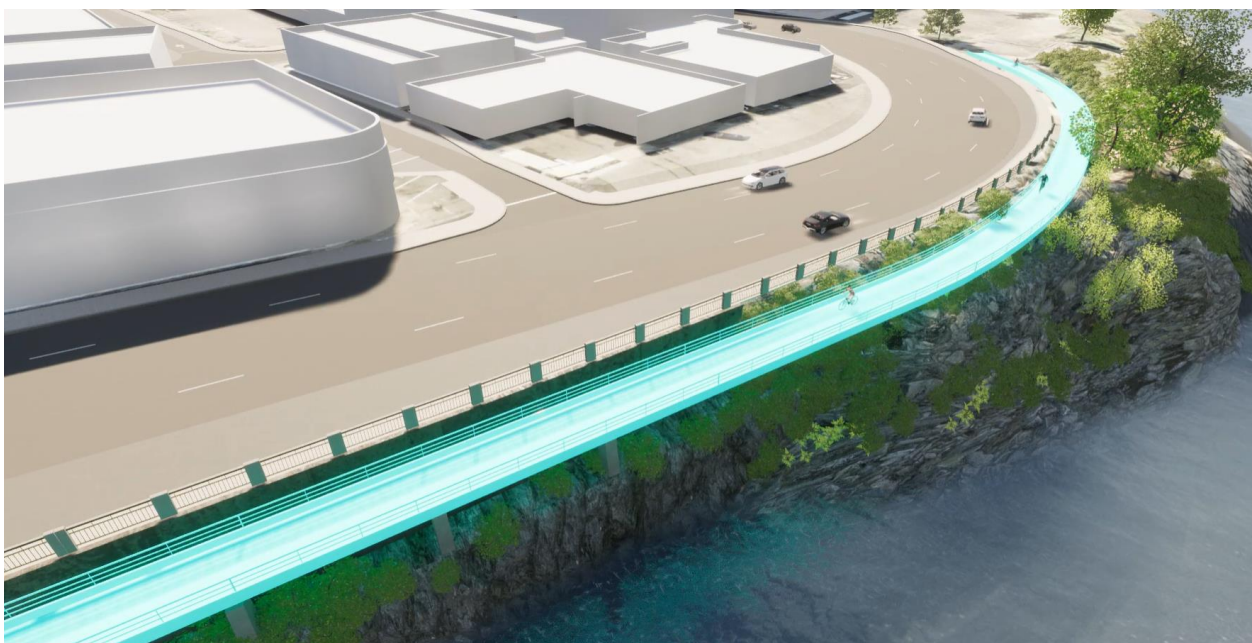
shows the High Route alternative at the Historic Arch Bridge. This alternative would bypass the Historic Arch Bridge between the arch columns with no structural impacts to the Historic Arch Bridge.
